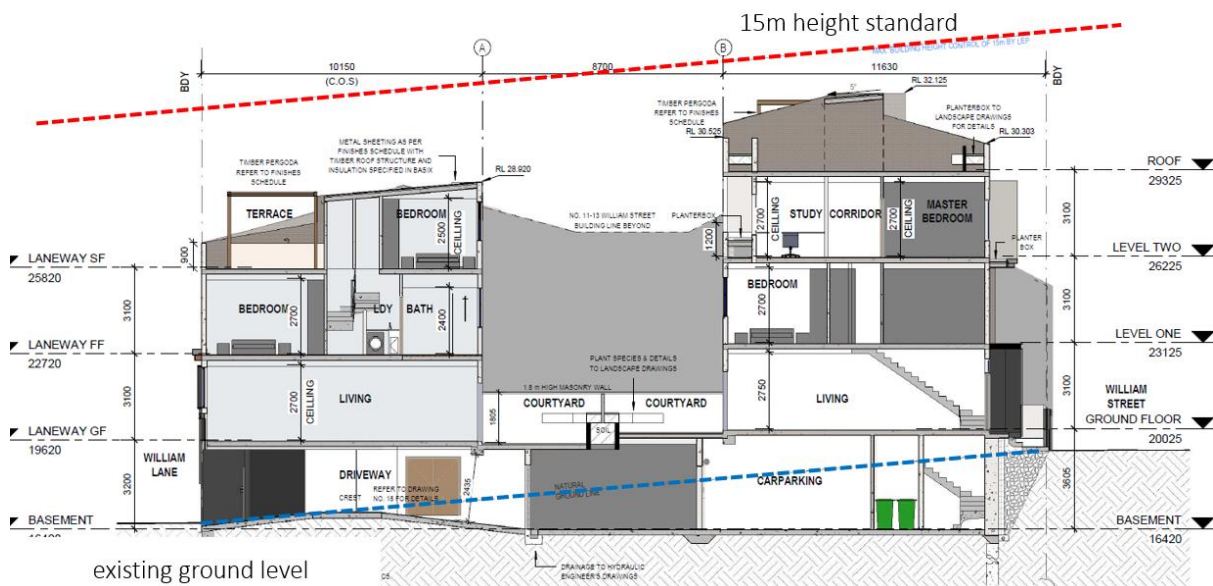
Section Plan showing partial basement under dwellings T8-T14 (William Street) and above ground parking areas under dwellings T1-T7 (William Lane)
